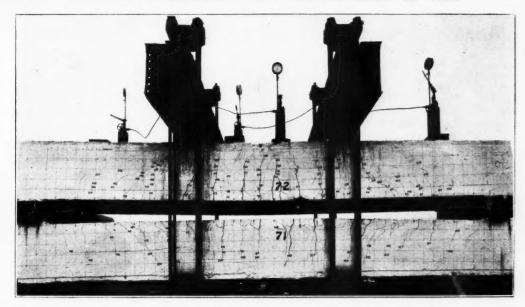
VIEW SHOWING TENSION CRACKS AT MAXIMUM LOAD.
